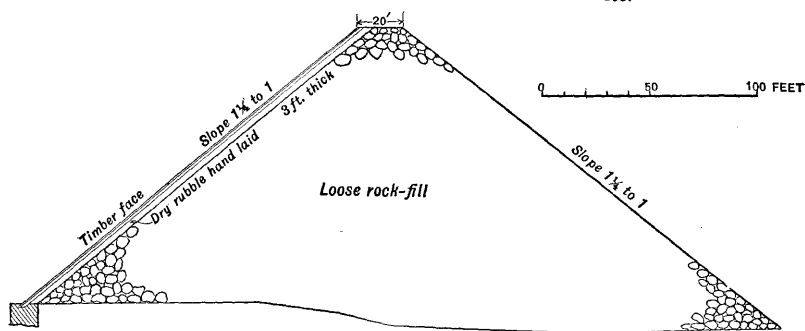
Section of rock-filled dam, Briscoe dam site.
